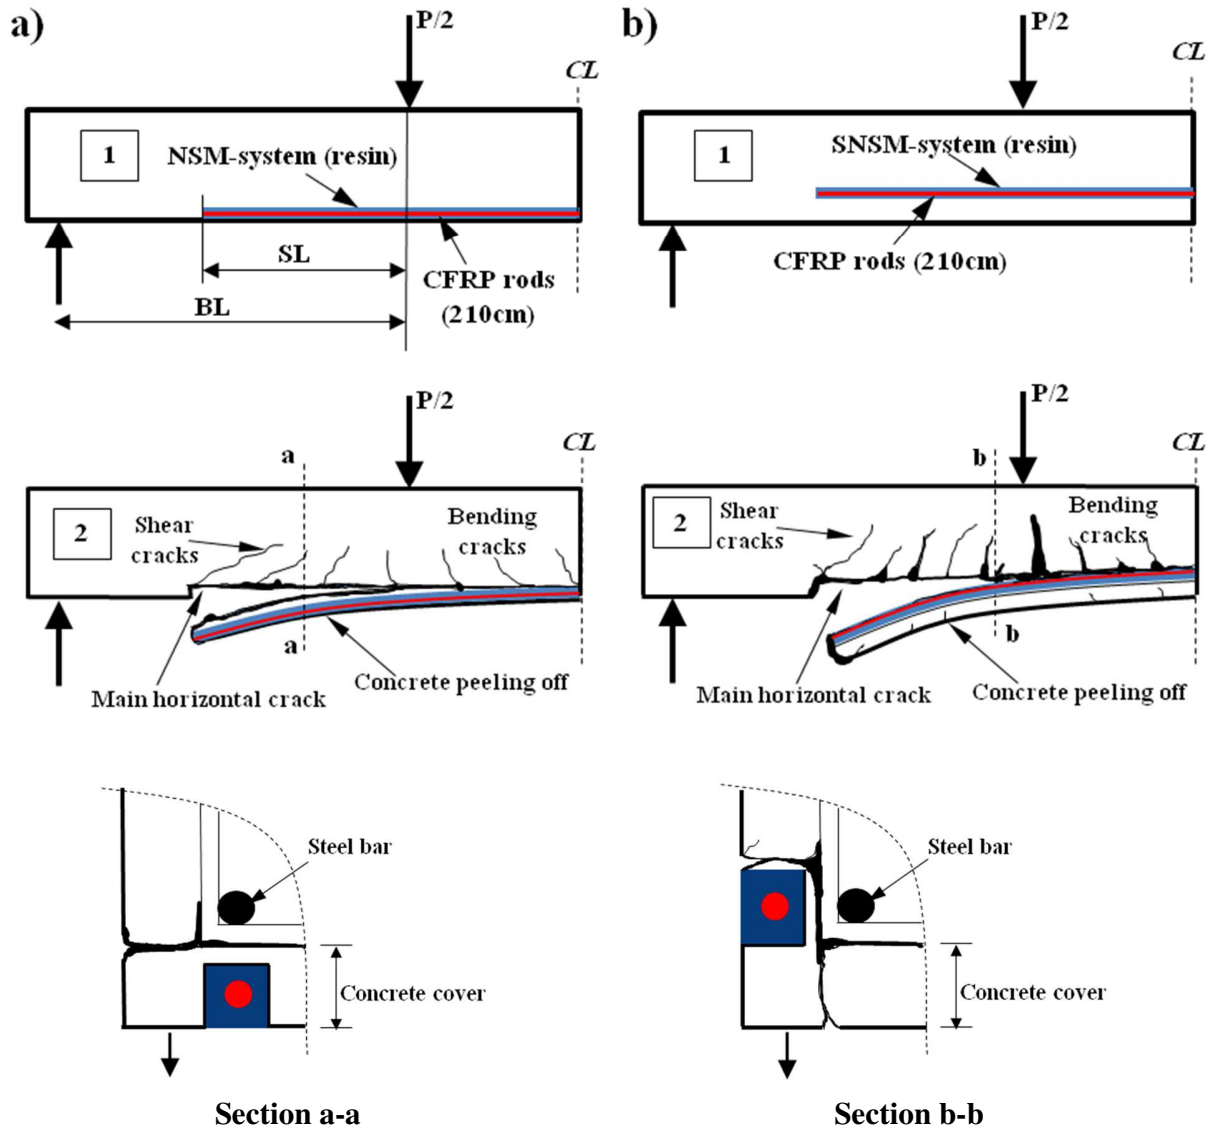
Peeling off failure mechanism of: a) BC2(210-SR) beam and b) S-C6(210-R) beam
